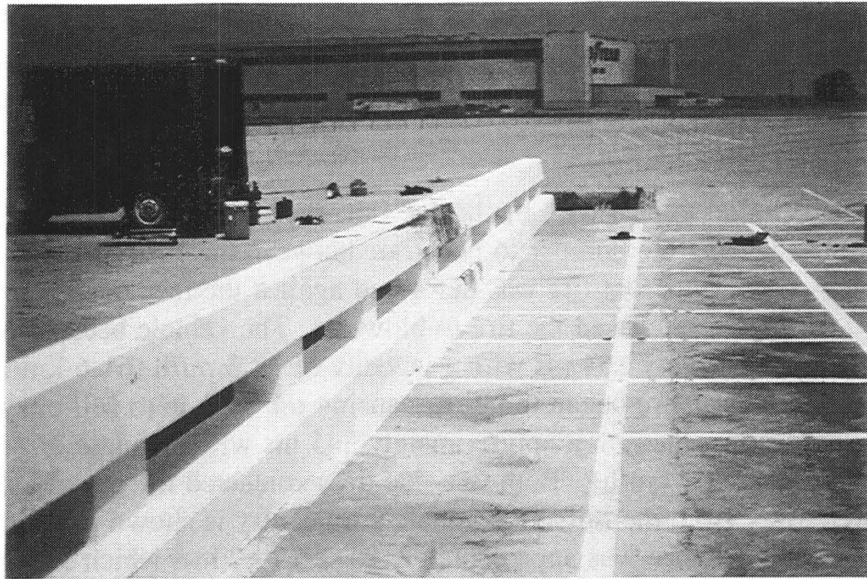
Bridge Rail Damage, Test NTBR-1.
